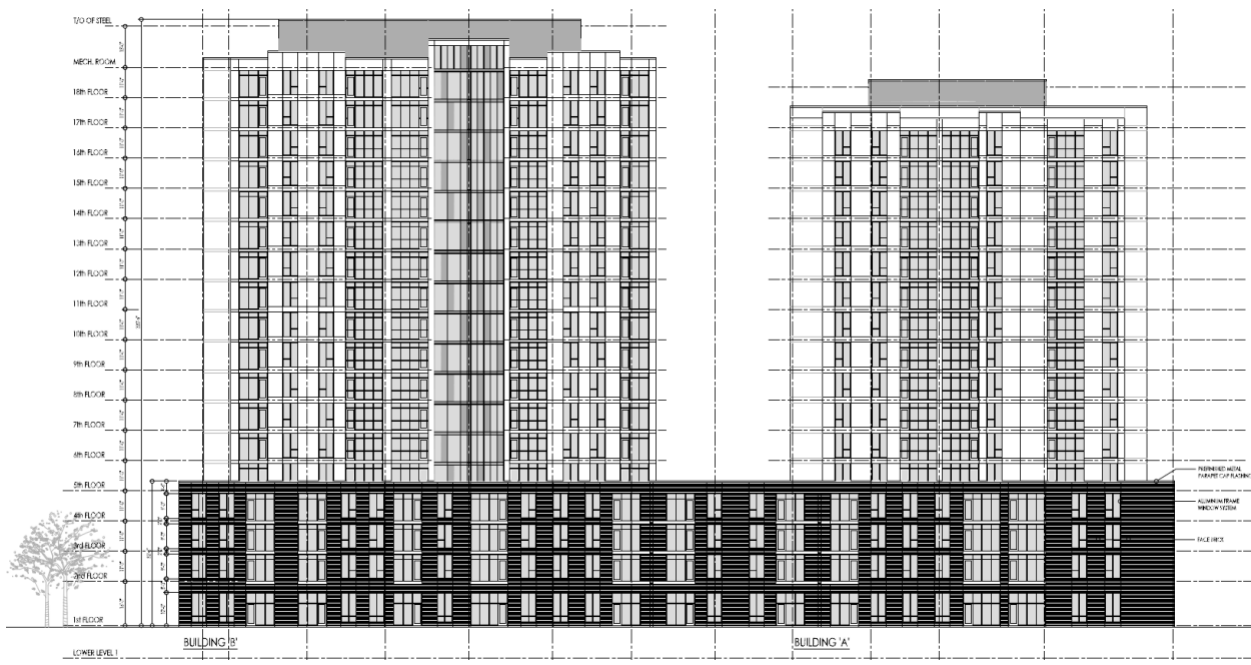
North Elevation (Side of Building ‘B’ [Left] and Building ‘A’ [Right])
